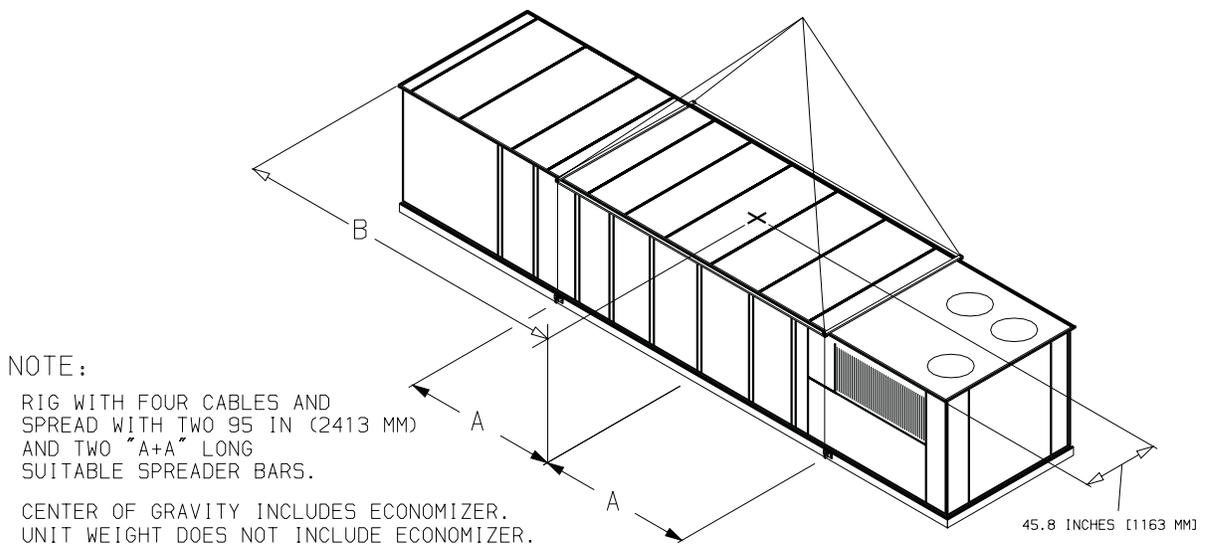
Rigging Label — Size 030-050 Units (Standard Chassis)
